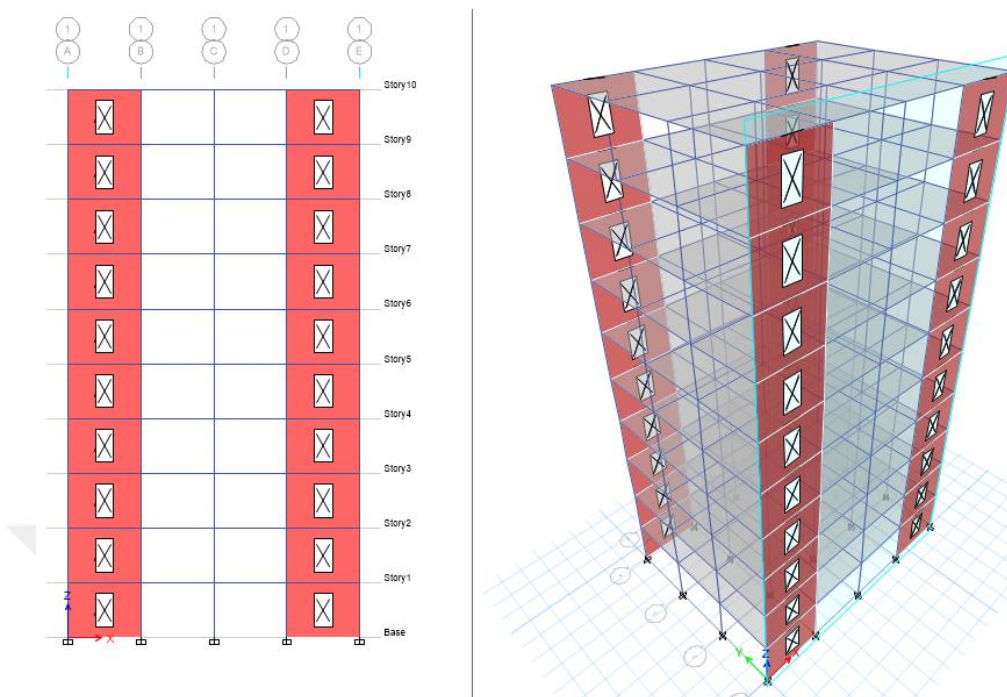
The 10-story building with concrete shear walls and with vertical openings.
